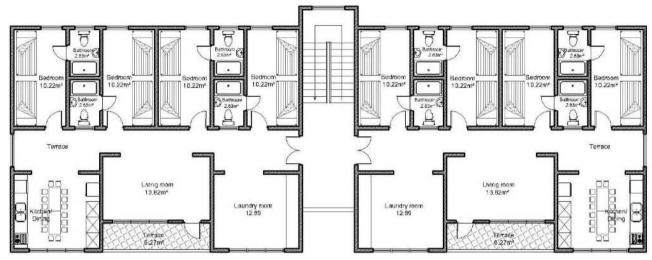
Floor plan of the building with 8 bedrooms per level.
